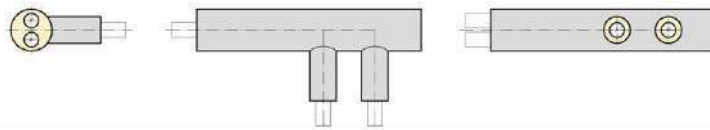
Transition fitting from TWIN PIPE to single pipe system – F type
